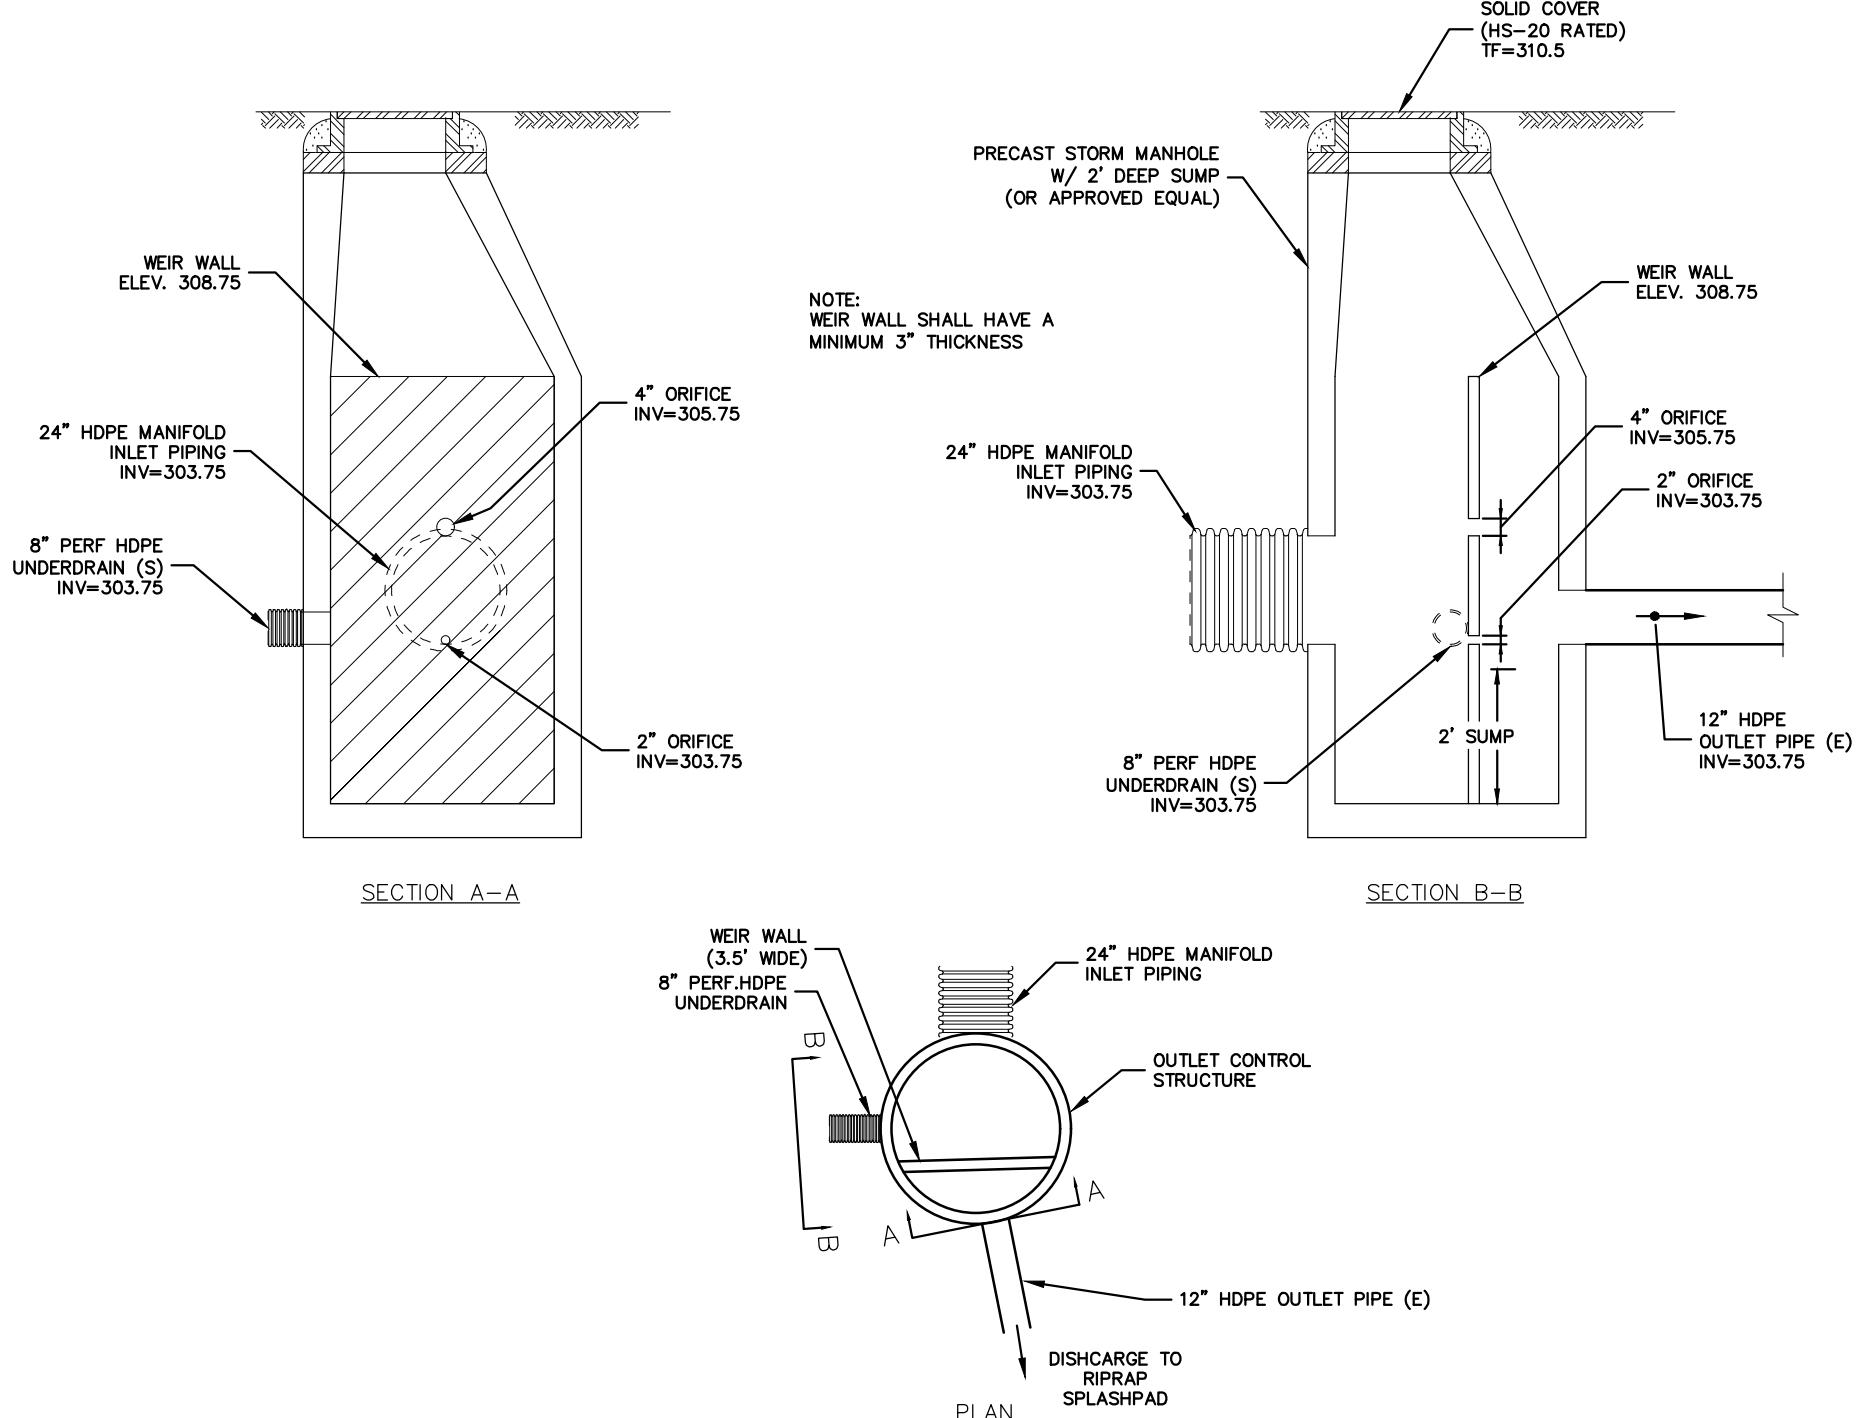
OUTLET CONTROL STRUCTURE (OCS-1) AND PIPING DETAIL
